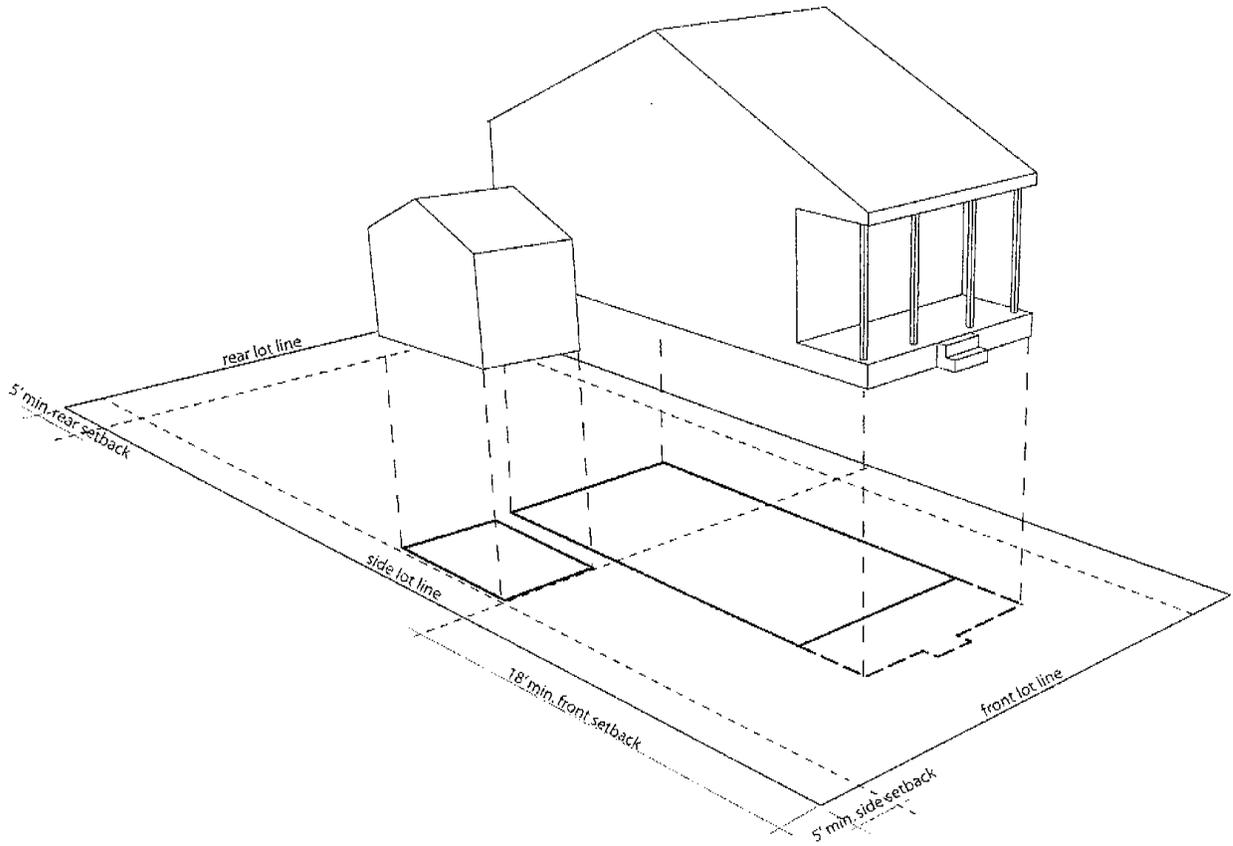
Minimum Setbacks for Garages Accessed from Street Frontage
